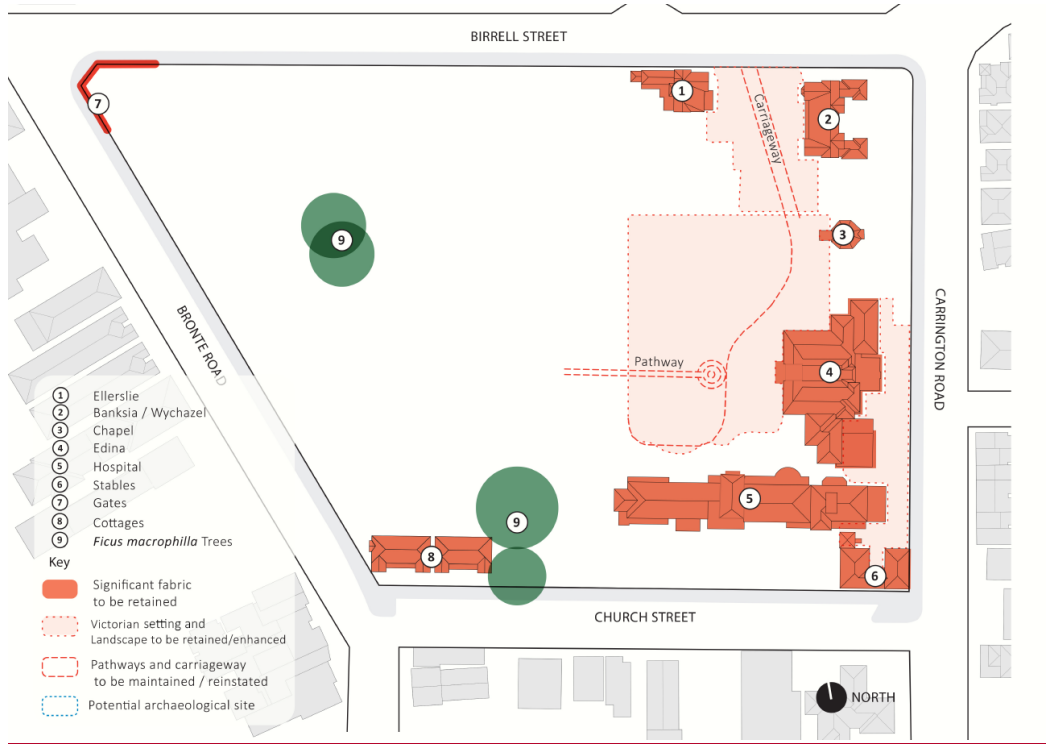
Site Plan identifying significant fabric and spaces to be retained
